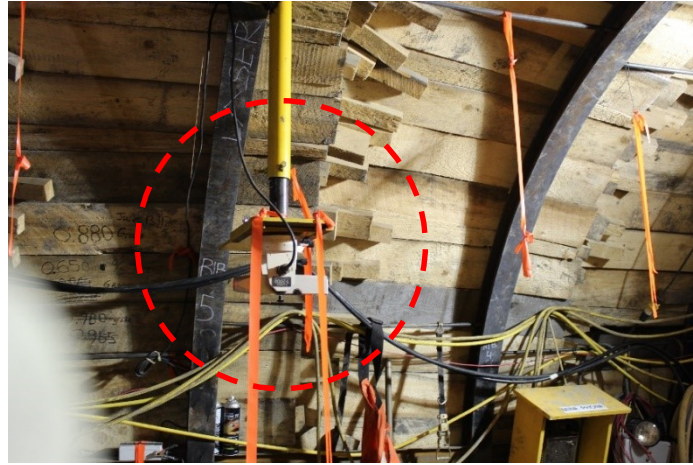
Wood ceiling in the shaft and hand-dug tunnel sections
